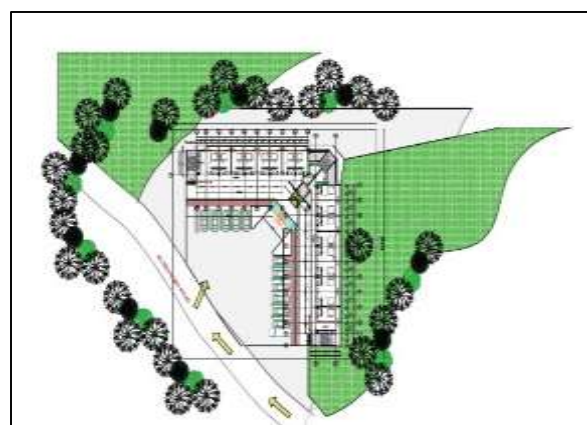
General Layout Plan of the Proposed Postgraduate Executive Hostel Building Site
